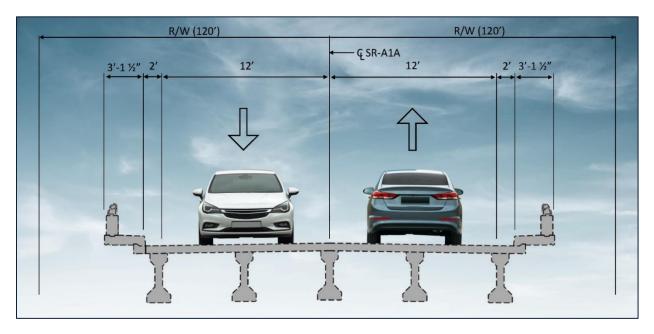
EXISTING SR A1A BRIDGE TYPICAL SECTION
